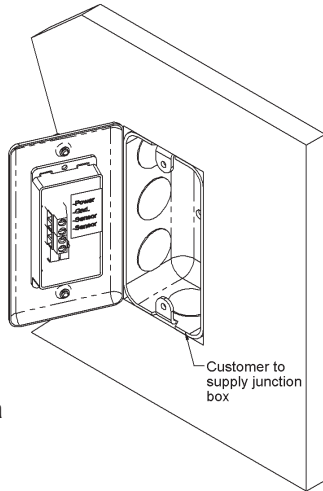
Transmitter w/ plate mounted in a Handy Box
